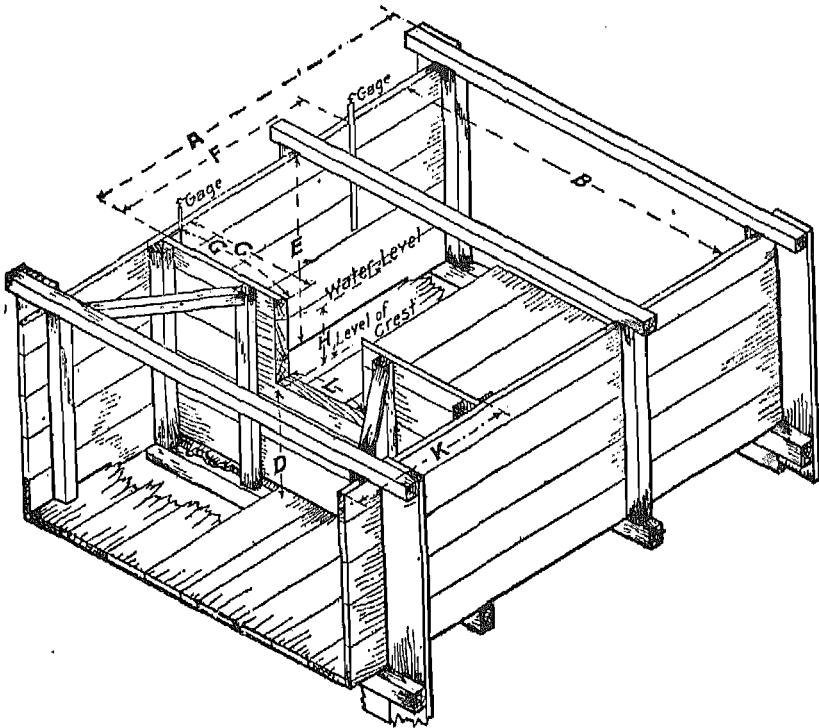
Plan of weir box. (U.S.D.A. *Farmers' Bul.* 813.)
